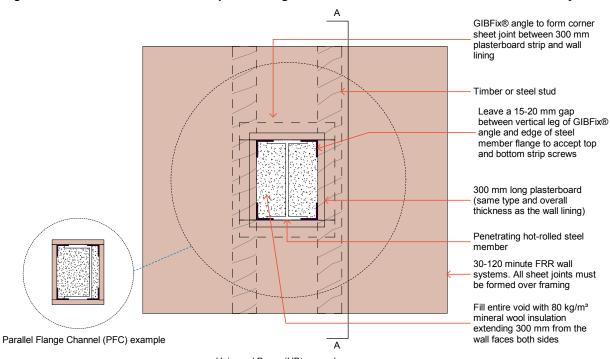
Hot-rolled structural steel penetrating 30 - 120-minute FRR timber/steel frame wall systems
